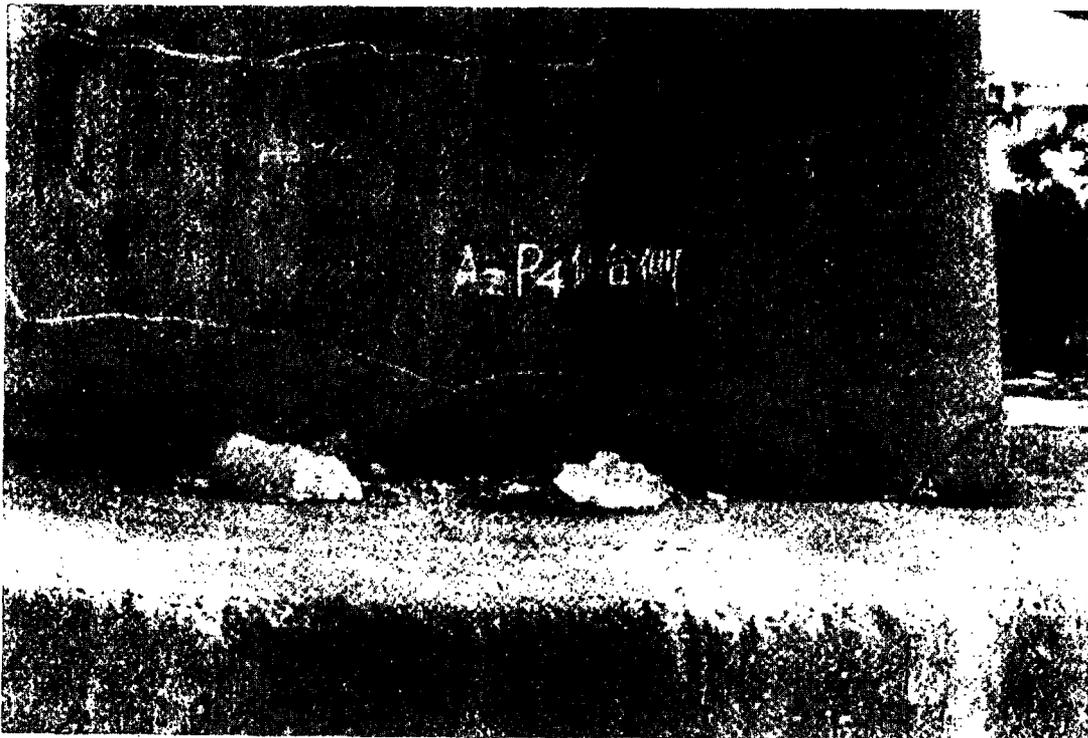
Sendai Ohashi Bridge. Typical pier damage at the construction joint between pier and cap. The vertical rebars are buckled across the joint. Significant concrete spalling is evident. Horizontal cracking around the pier was discovered upon excavation of soil around the piers. (Courtesy J.M.O.C.)
